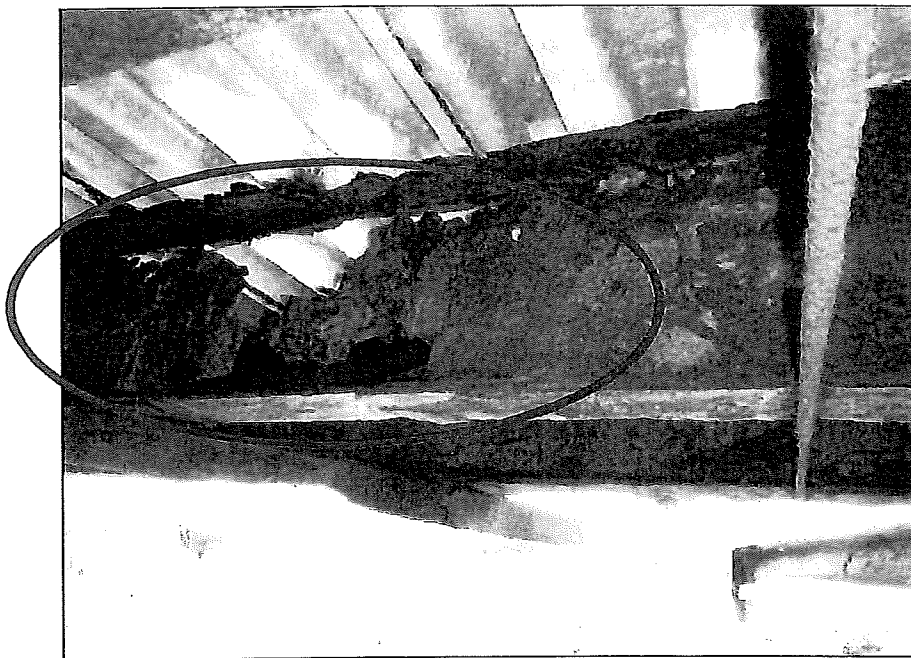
Area of 100% Section Loss in Beam 2 at Mid-Span 1
